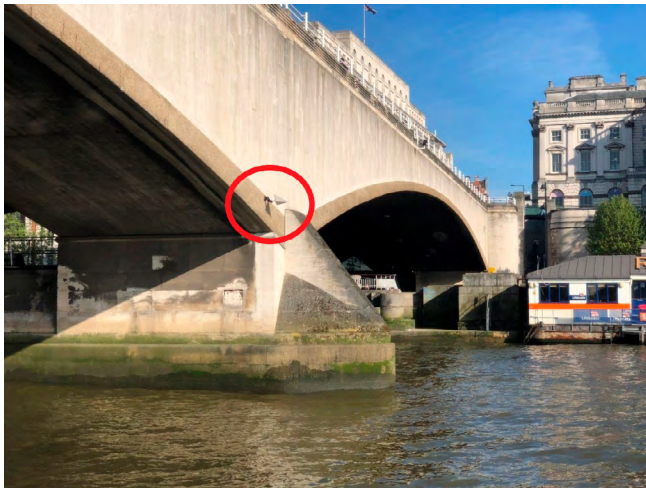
Aluminum reflector installed on one of the Waterloo bridge piers.
